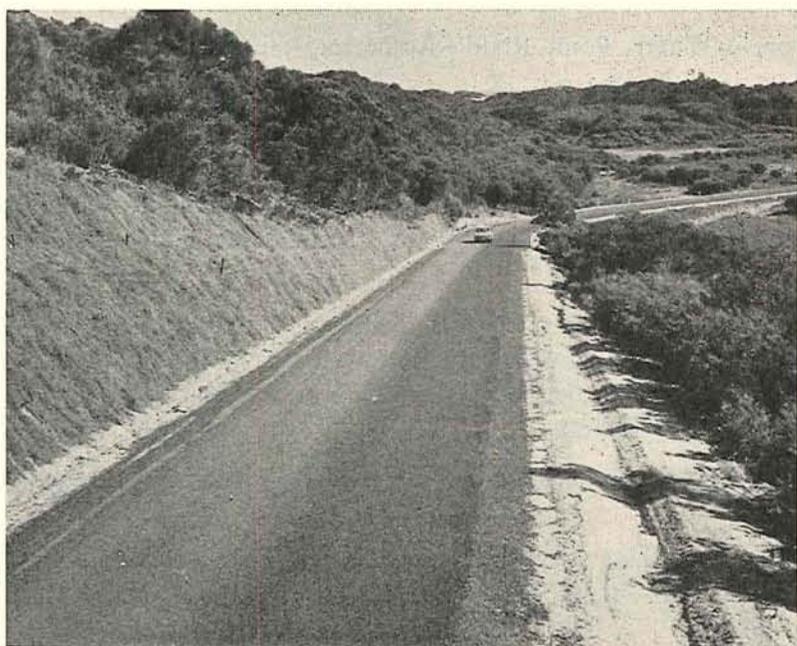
Wilson's Promontory Road—Reconstructed section north of Derby River.
